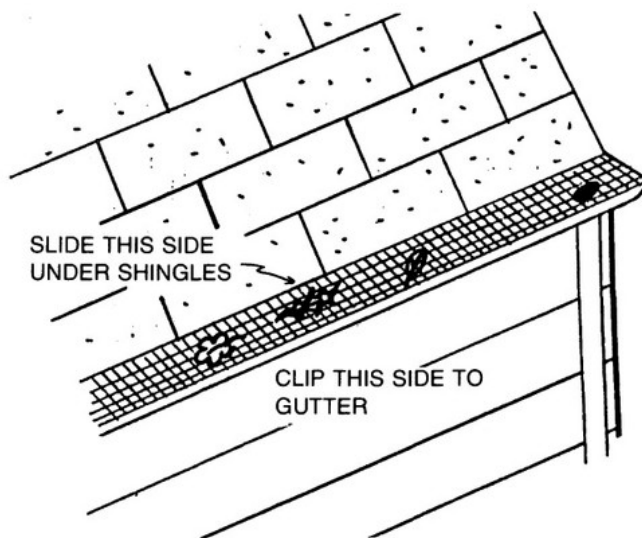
Gutter guard. (Source: Midwest Plan Service, Iowa State Univ. 1968. Private Water Systems p. 14)
